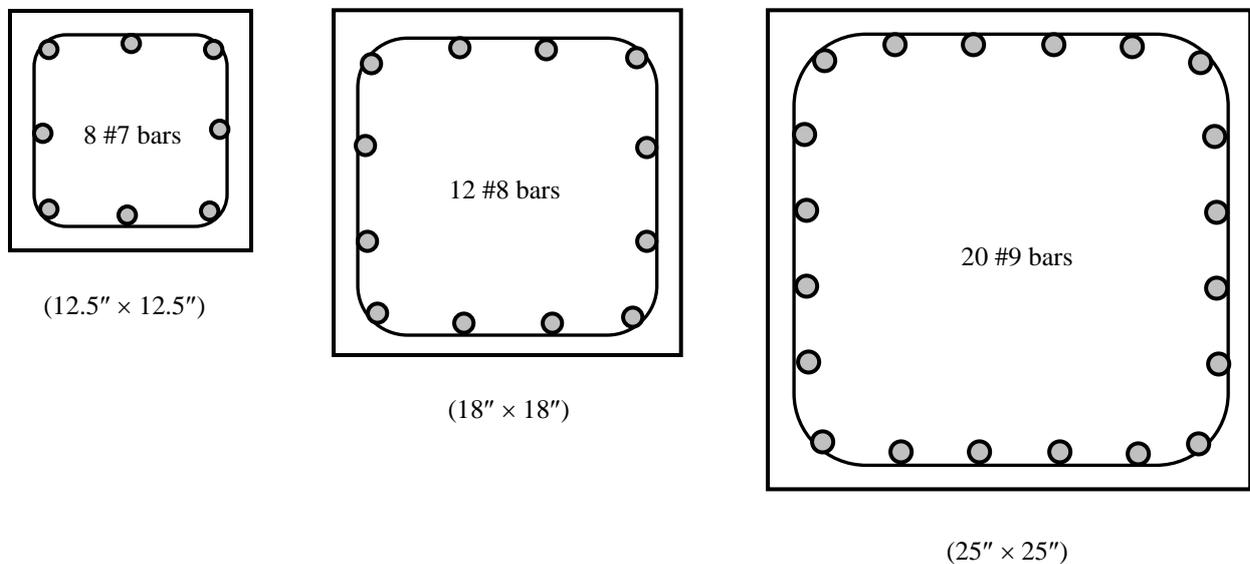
Column Sections of 6-, 12- and 24-storied buildings
